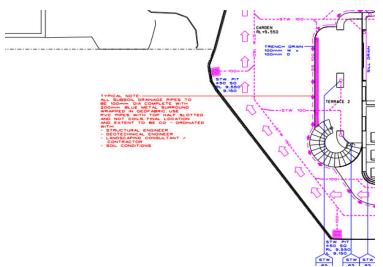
Stormwater plan extract showing drainage pits and overland flow path within immediate proximity of existing retaining wall.
